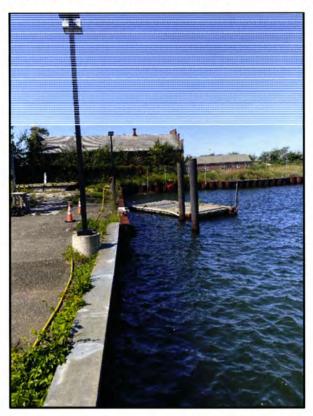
View of project work zone, looking west from bulkhead Sta 3+70
